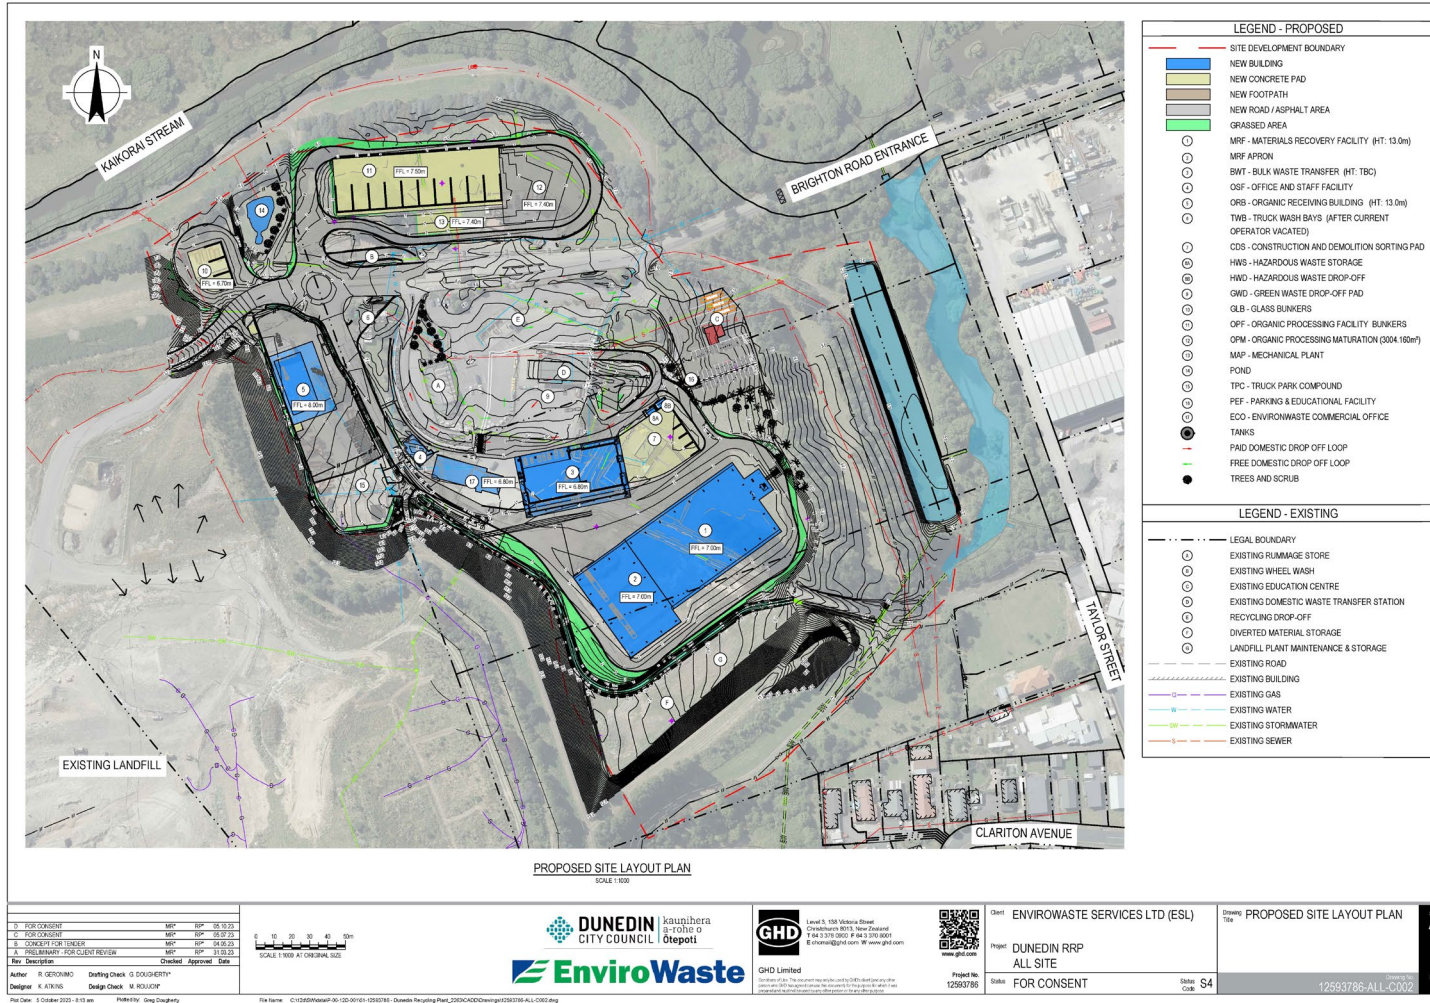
Green Island Resource Recovery Park Development Area Proposed Layout
